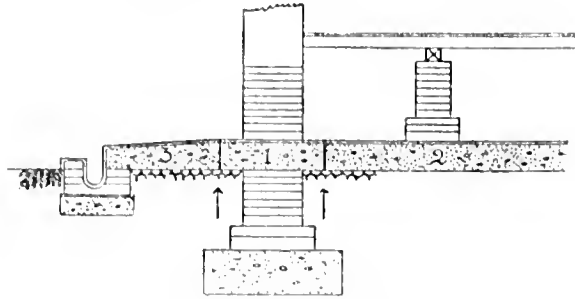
Detail of termite-proof construction; a layer of cement at ground level laid in three parts.
